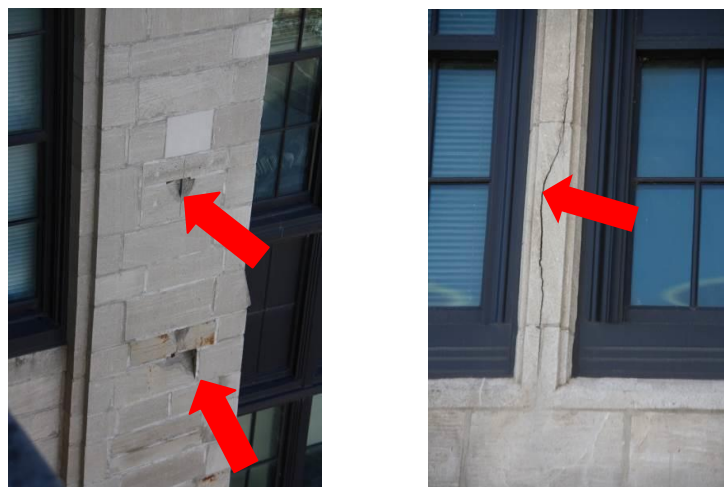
Spalled, cracked limestone due to corrosion of embedded steel strap anchors and dowels
